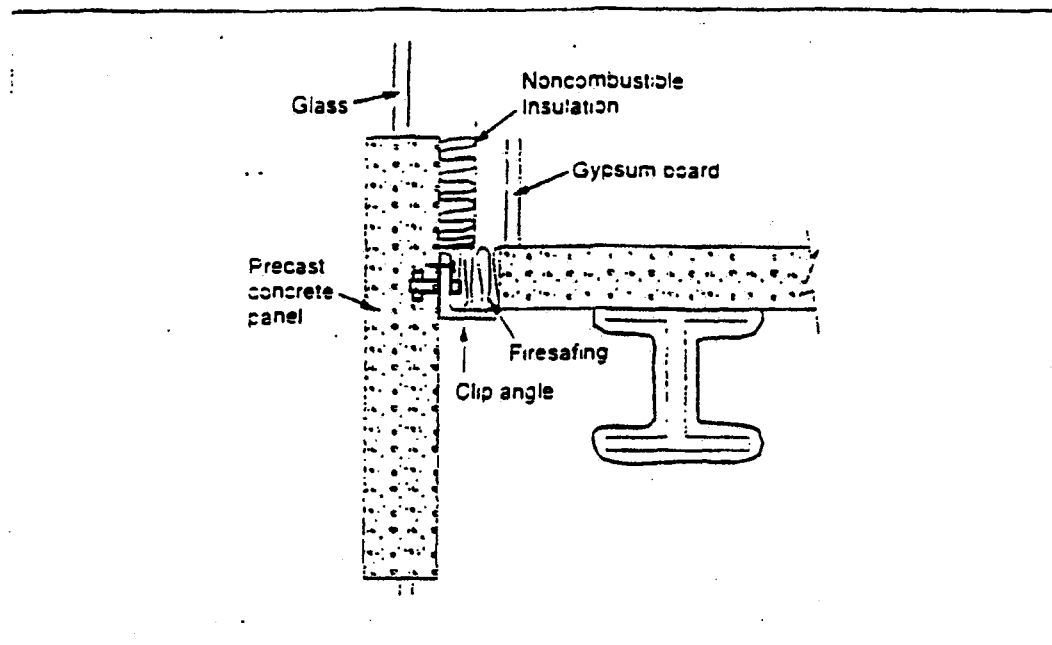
B. Firesafing friction fit into space and held in place by clip angle secured to exterior precast concrete panel.
